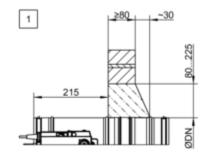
Mortar-based installation in solid wall - installation not flush with wall
